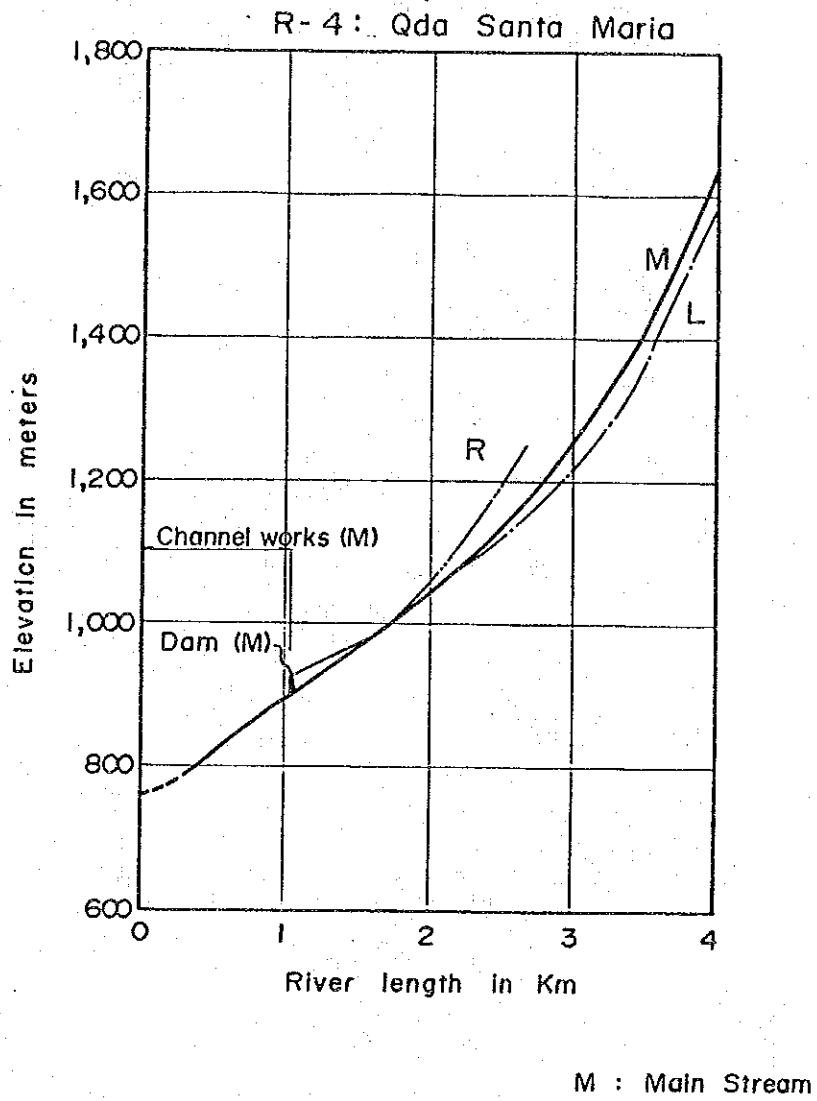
Structural Plan on Profile of Qda Santa Maria (R4)
